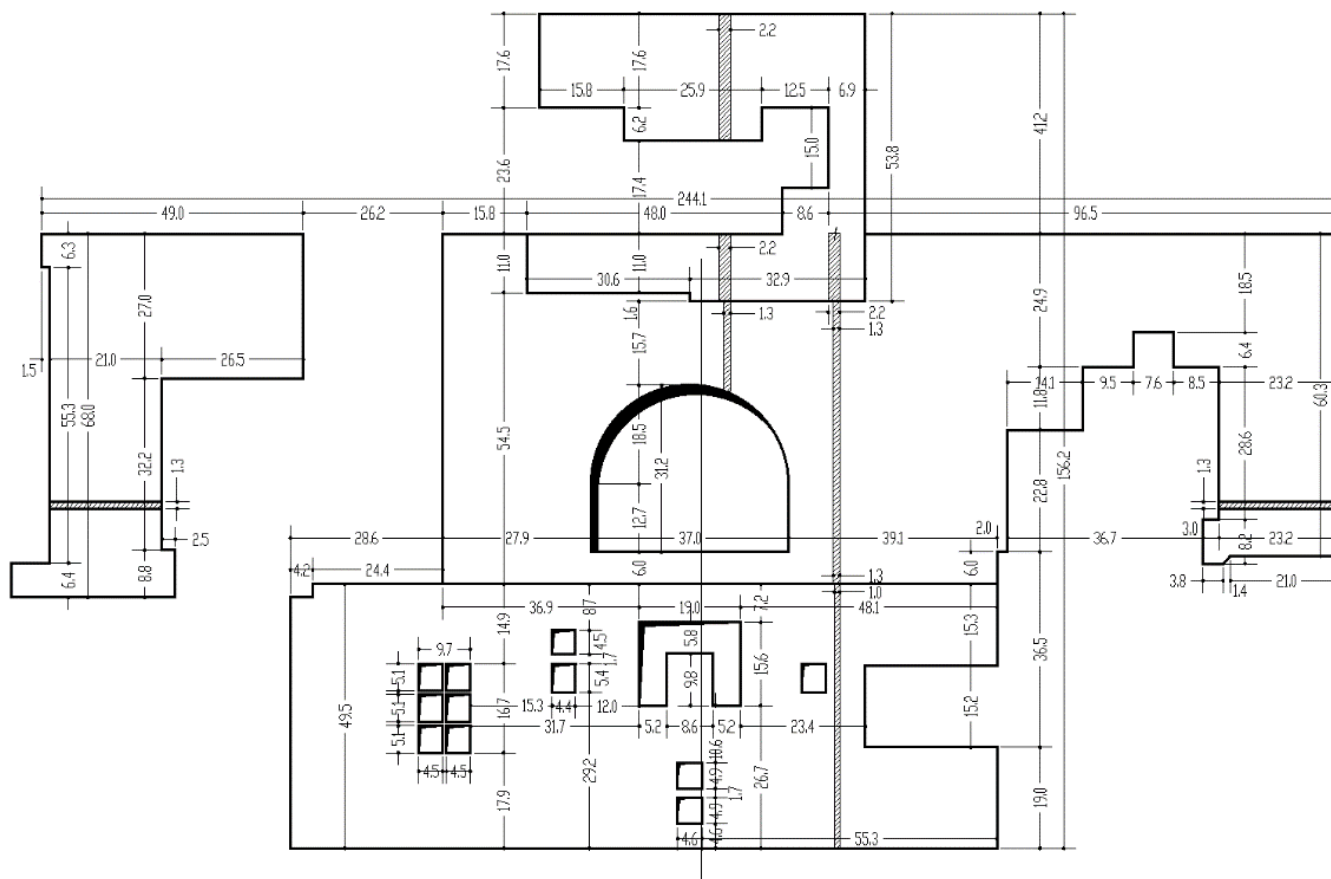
The use of the existing foundation mat as an underlayer for a new foundation system – simplified representation
